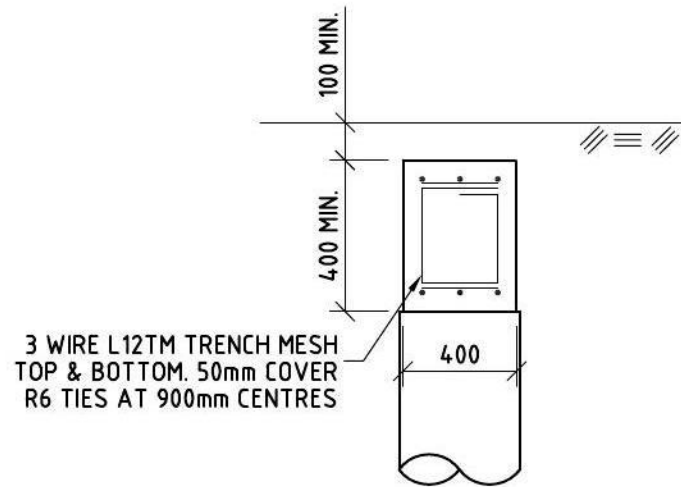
DETAIL - DEEP EXTERNAL EDGE BEAM "DEB1"
